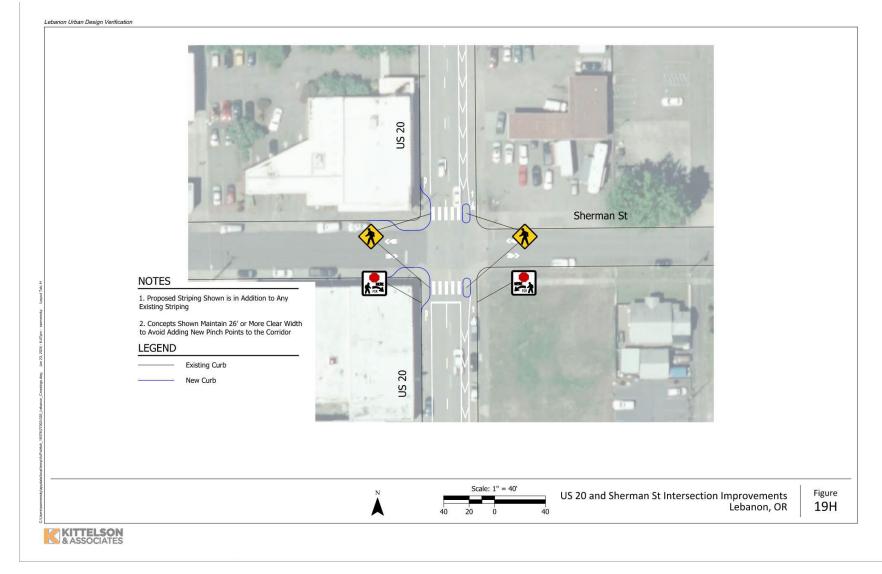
H: U.S. 20 and Sherman Street Intersection Improvements
